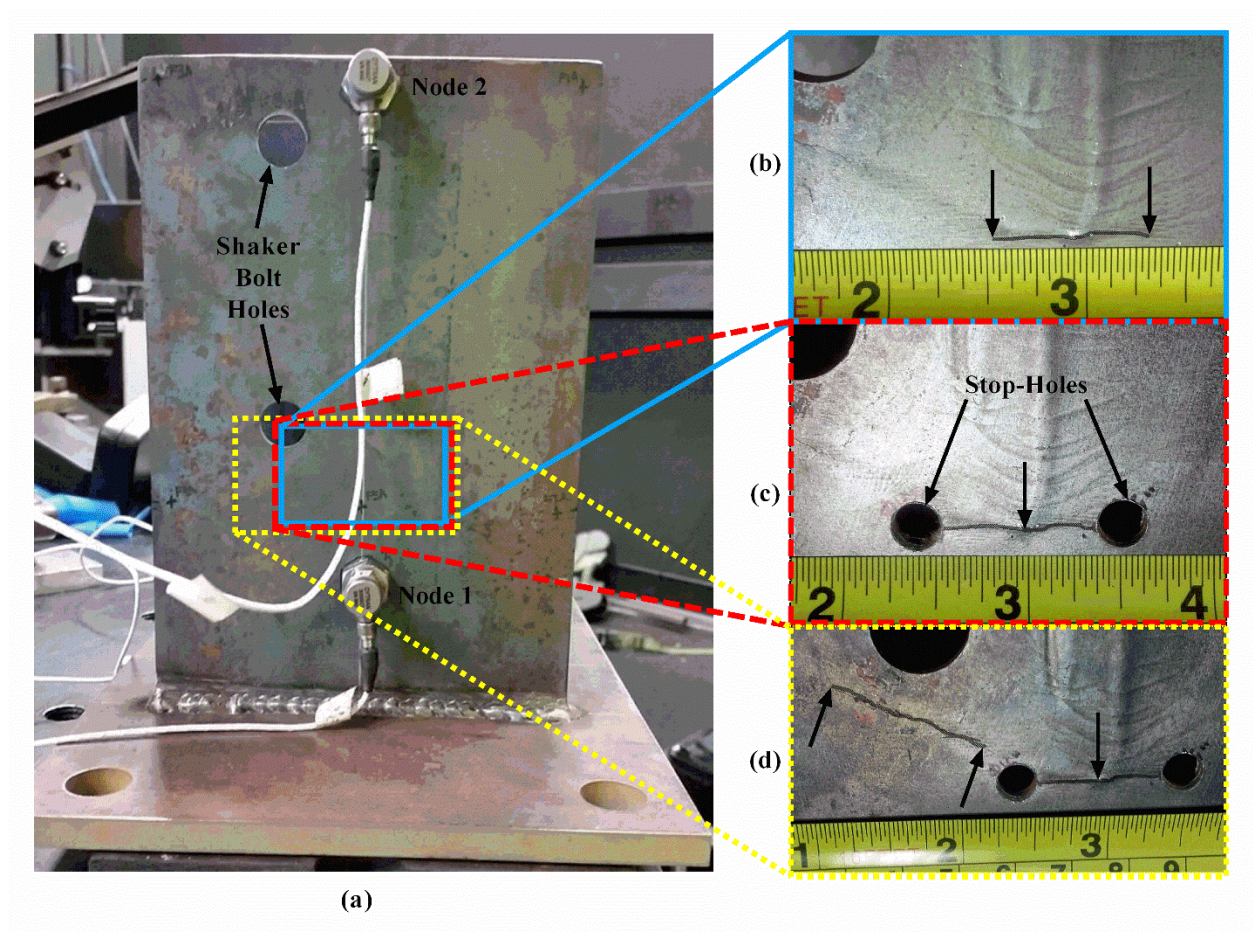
Damage caused in Specimen 1 - Side A: (a) overall side view indicating locations of damage, (b) 22 mm crack (D1), (c) 22 mm crack with 6.35 mm diameter holes drilled at crack tips (D1H), (d) 22 mm crack with 6.35 mm diameter holes drilled at crack tips and an approximately 25 mm crack originating away from the retrofit and propagating toward the existing crack (D2H)
